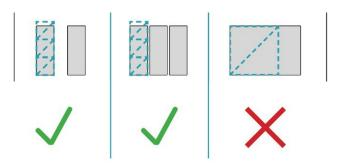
G.1: Vertical Window Proportion. Left, vertical window opening (permitted); center, grouping of vertically proportioned windows to fill a horizontal opening (permitted); right, horizontally proportioned window (not permitted)
